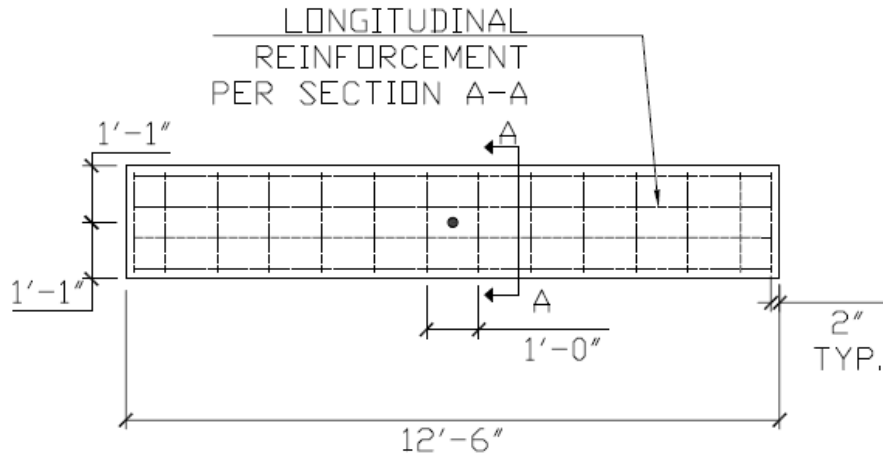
Plan view of Specimen 2 (Specimens 1, 3 to 7, 10, and 11 had the same design)
